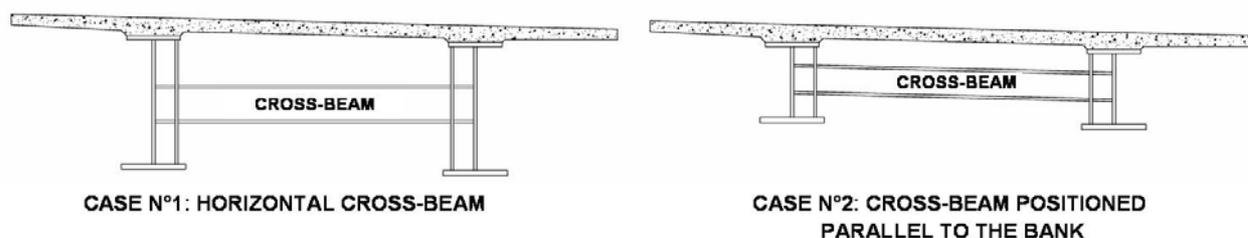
Cross-beam transverse orientation on a bridge with deck unidirectional banking
